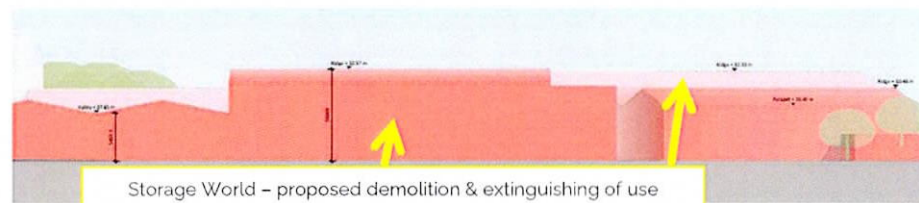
Excerpt from Applicant's proposed demolition elevations (3)
